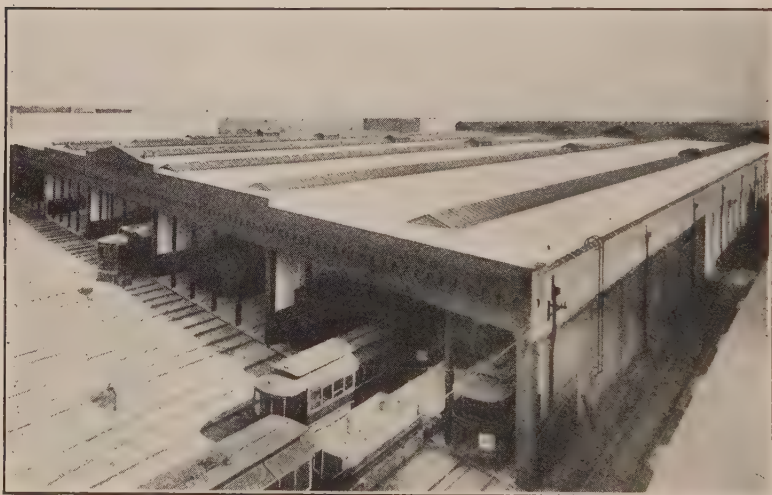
Reinforced Concrete Roof of Car Barn in which no waterproofing was used; Chicago City Railway Co., 77th Street and Vincennes Road.
